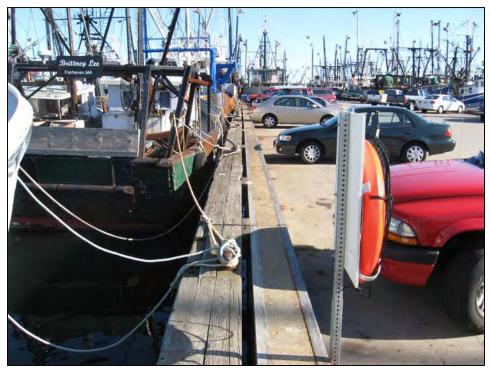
Overview of the concrete curb and fender system on the north face of the pier.
